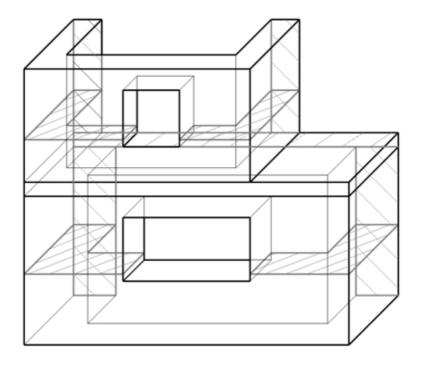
Ground plans and a vertical sections represented in an schematic 3D view.
